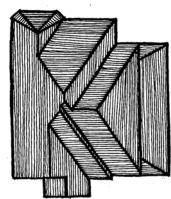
Example of Simple Roof (Acceptable)
